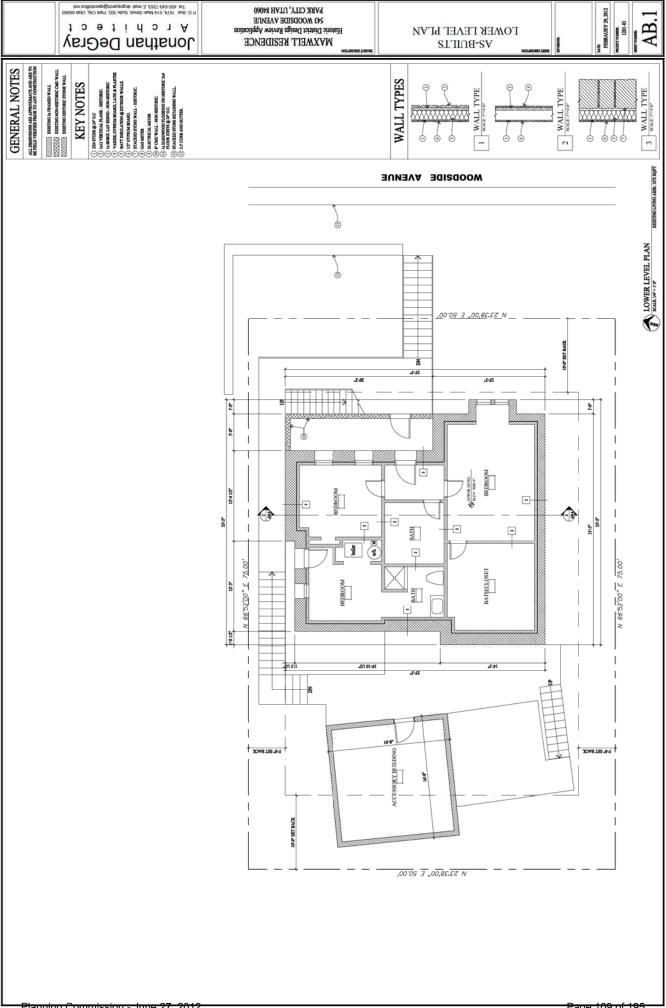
Exhibit A - Plans (existing conditions, site plan, elevations, floor plans)
